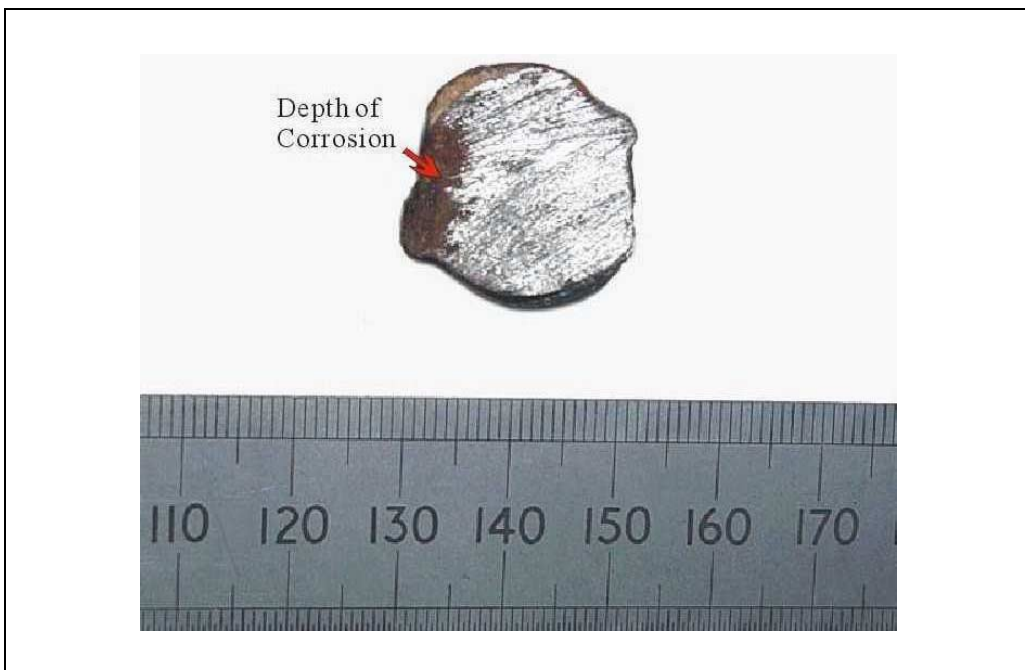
Cross-sectional View of the Corroded Steel Bar
